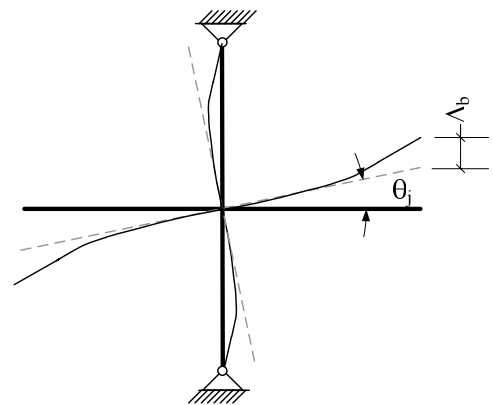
Frame deformation due to elastic bending of the column and deformation of the beam.
